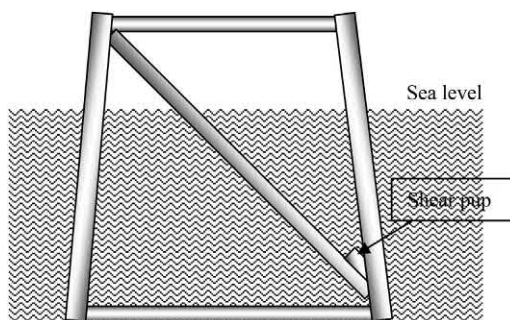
Sketch of proposed wet weld repairs.
